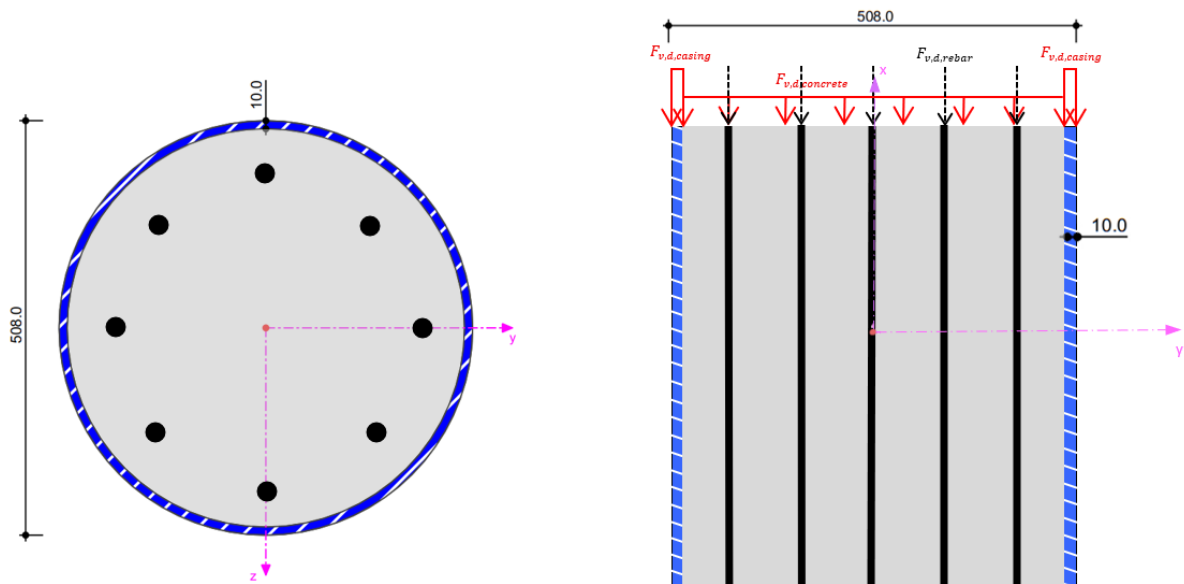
Horizontal and vertical cross section of CFSP-pile with load distribution over steel casing and concrete core
